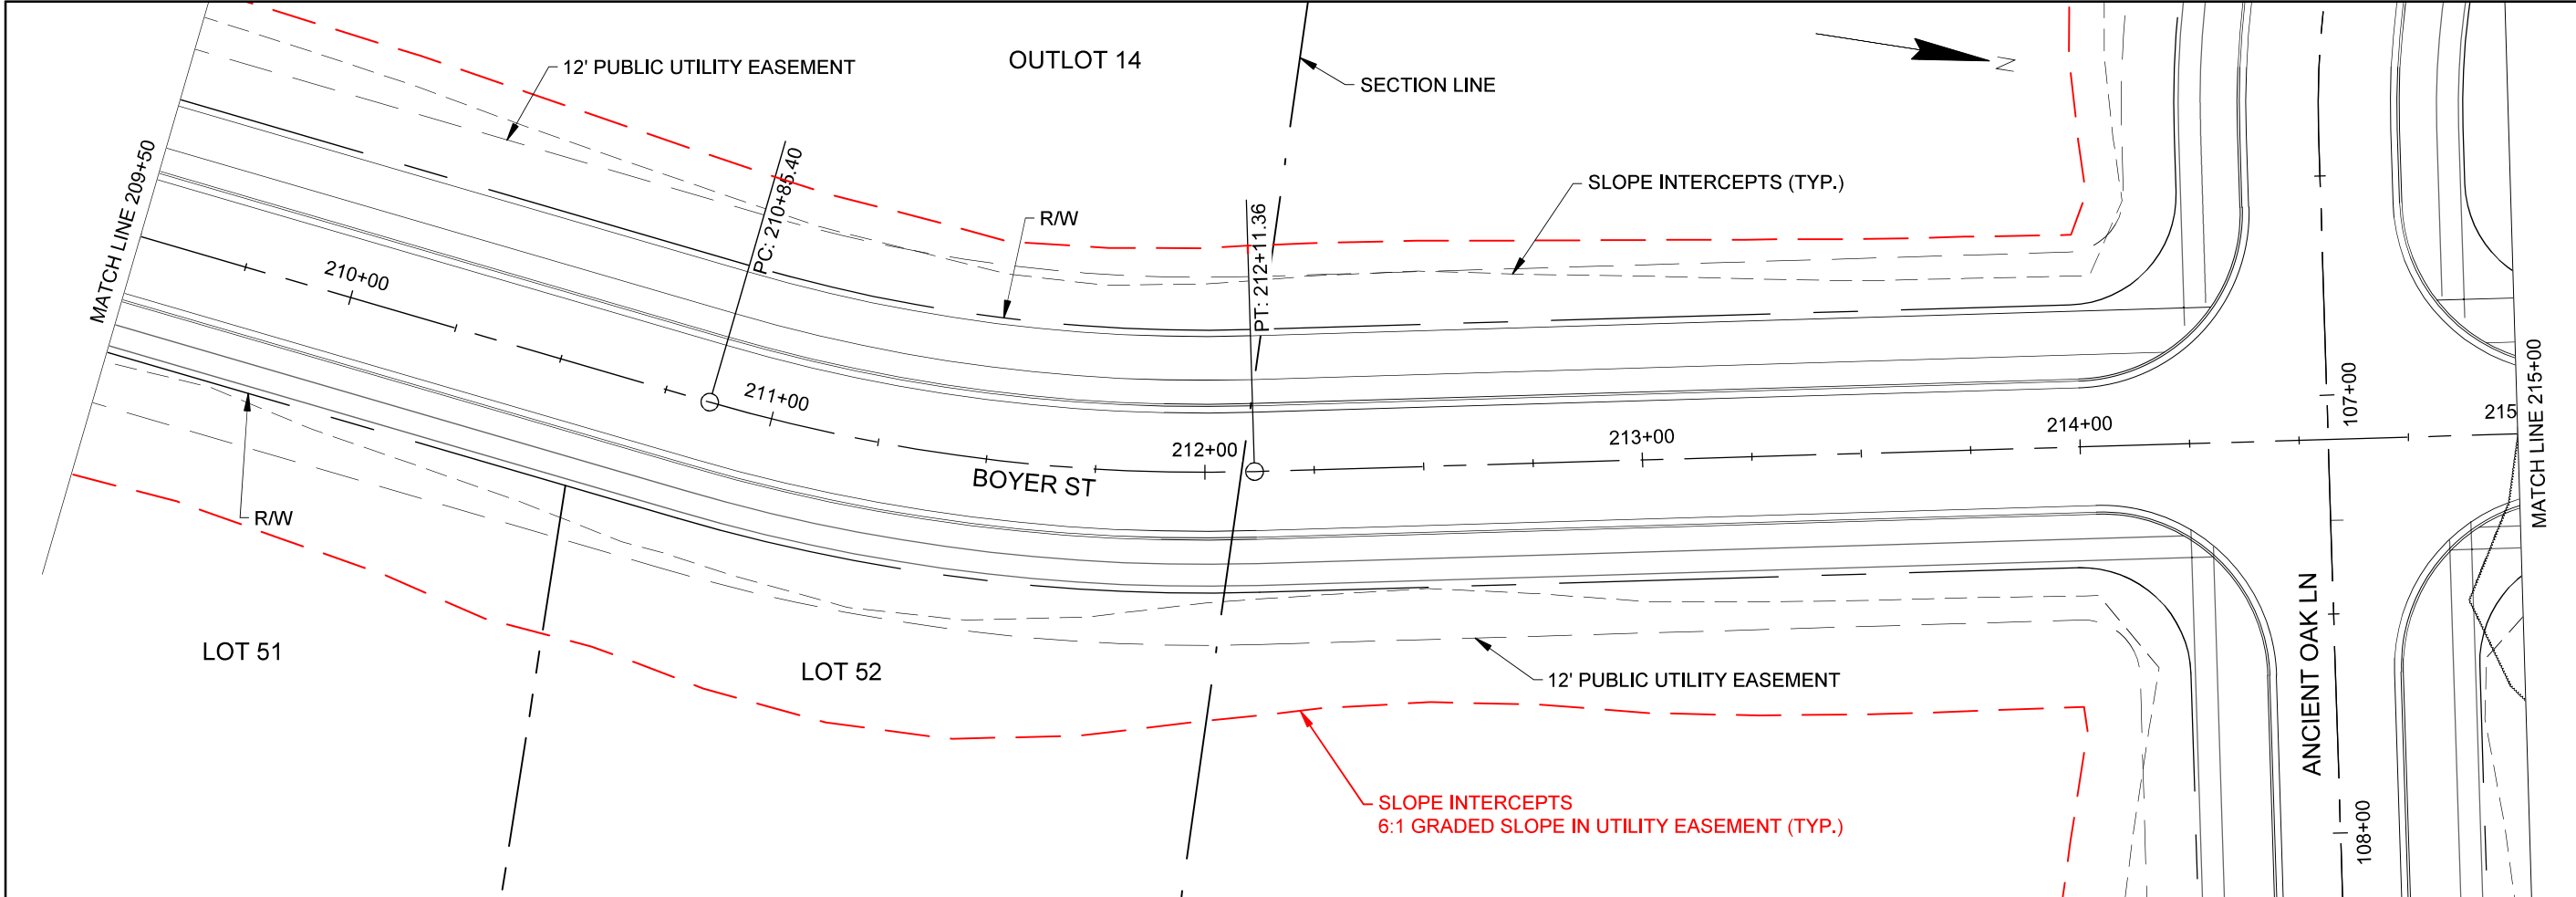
Proposed Boyer Street Plan and Profile (Continued)
